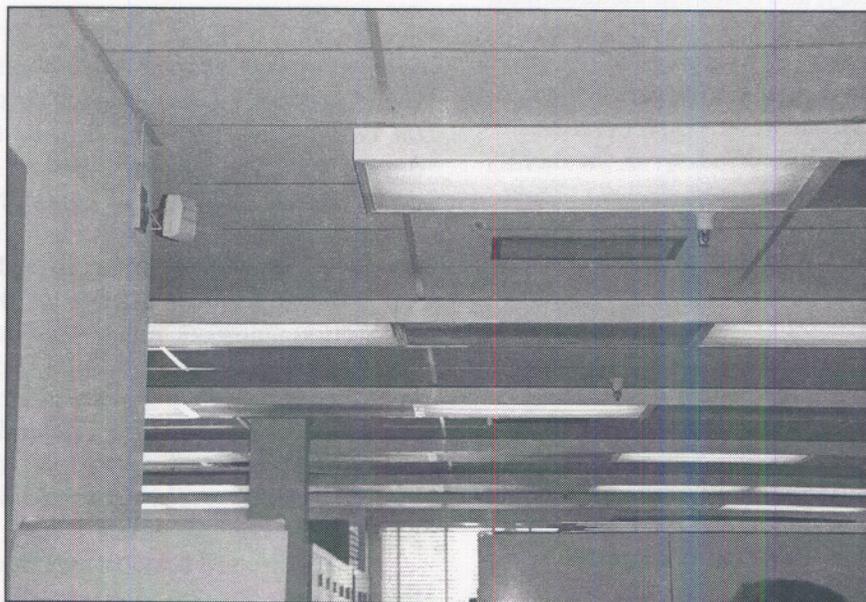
Overhead sprinkler system in the laboratory of ASM's South Building.
